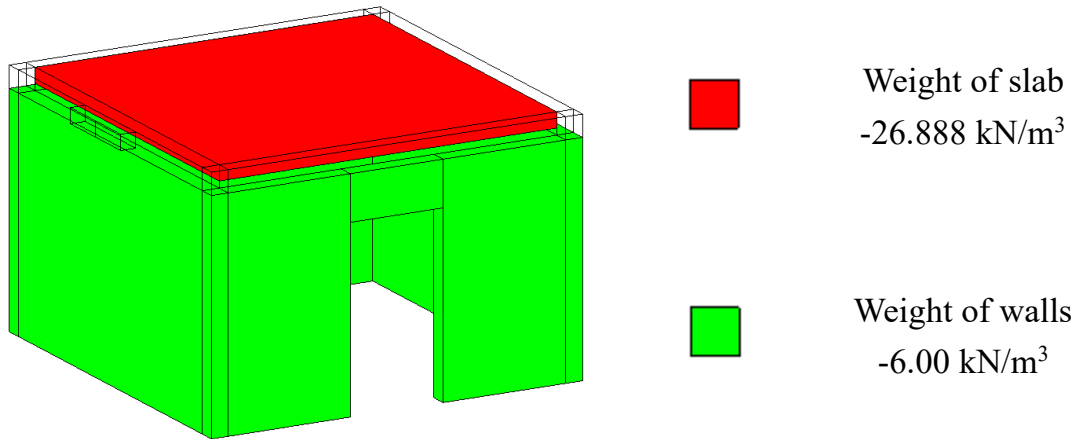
First load sequence – self-weight of slab and masonry walls
